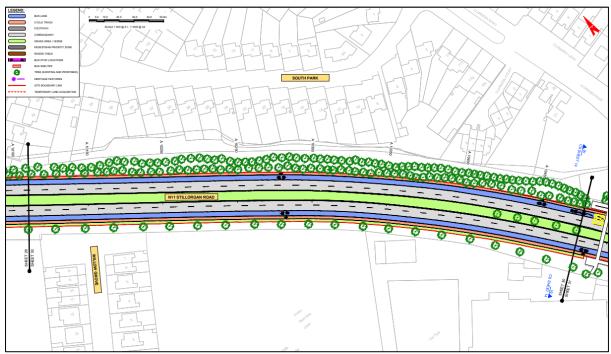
Extract from General Arrangement Drawings at South Park at South Park (Sheet 30)
